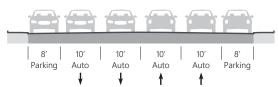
GAGE AVENUE - EXISTING CROSS SECTION
